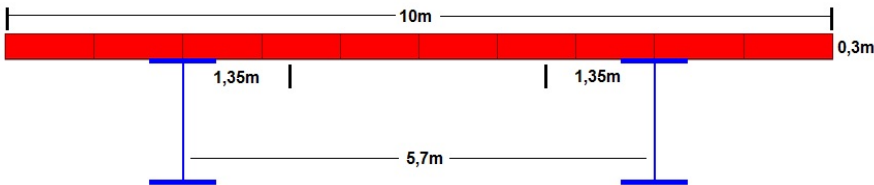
Section of the cross section of the girders and deck in Case 2.
